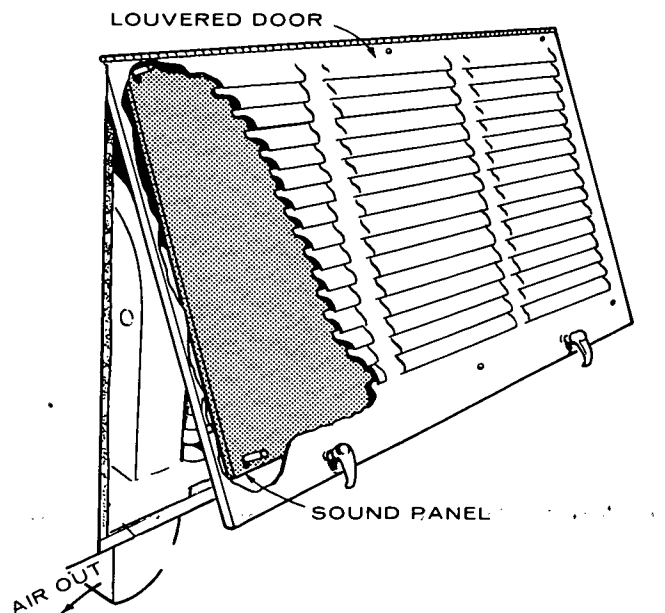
TYPICAL LOUVERED DOOR AIR INLET
